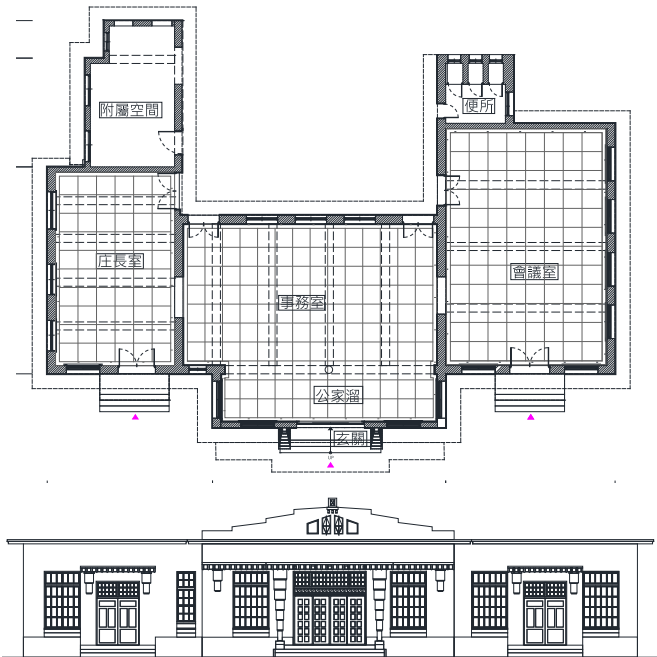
Spatial use and elevation of Wuri Municipal Government Building in 1932
